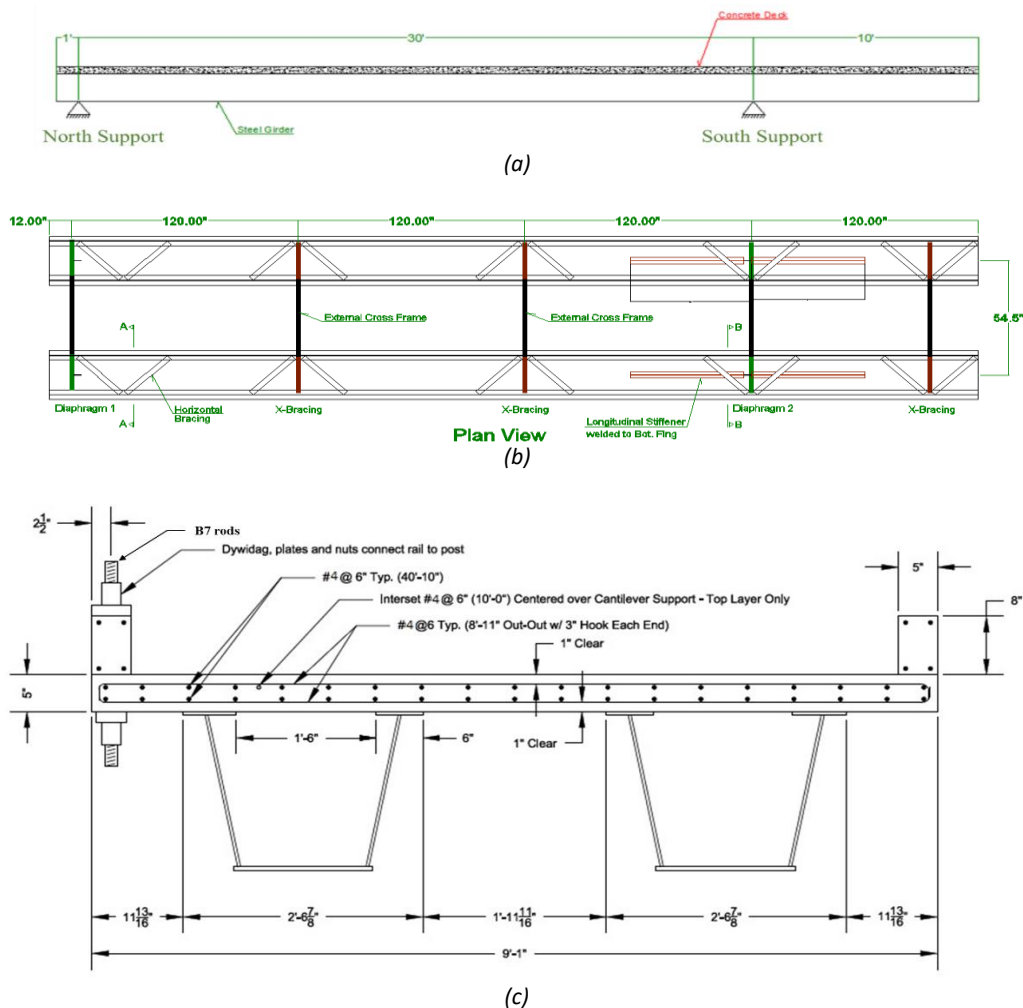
The Florida International University bridge: (a) Side view; (b) plan view; (c) cross-section view.
